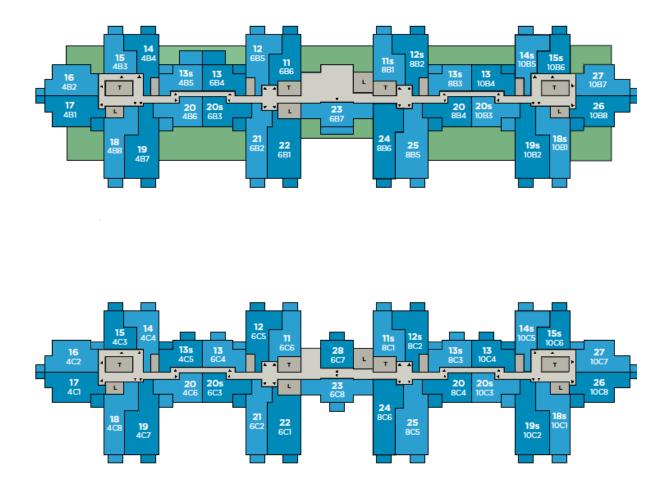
Ground floor and 1st floor new situation (Company A, 2014)
